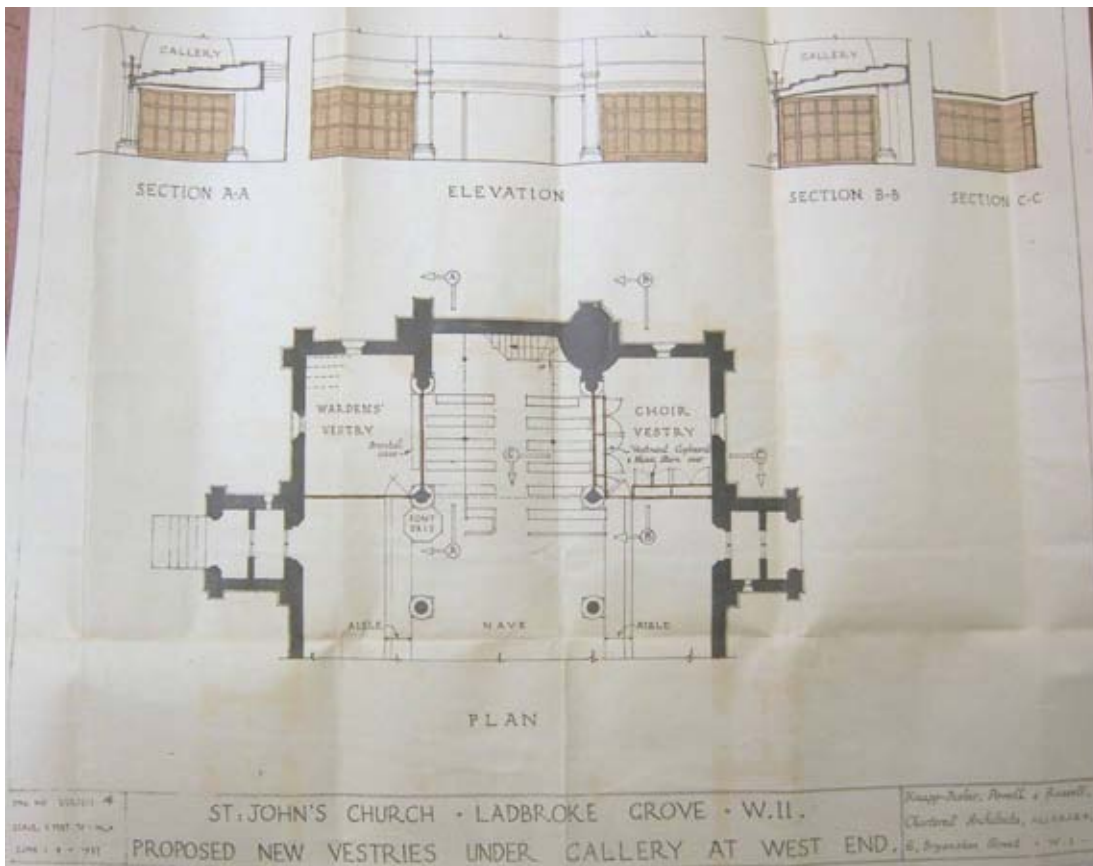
Basic plan of the layout at the west end of the nave in 1937 (Guildhall Library).
